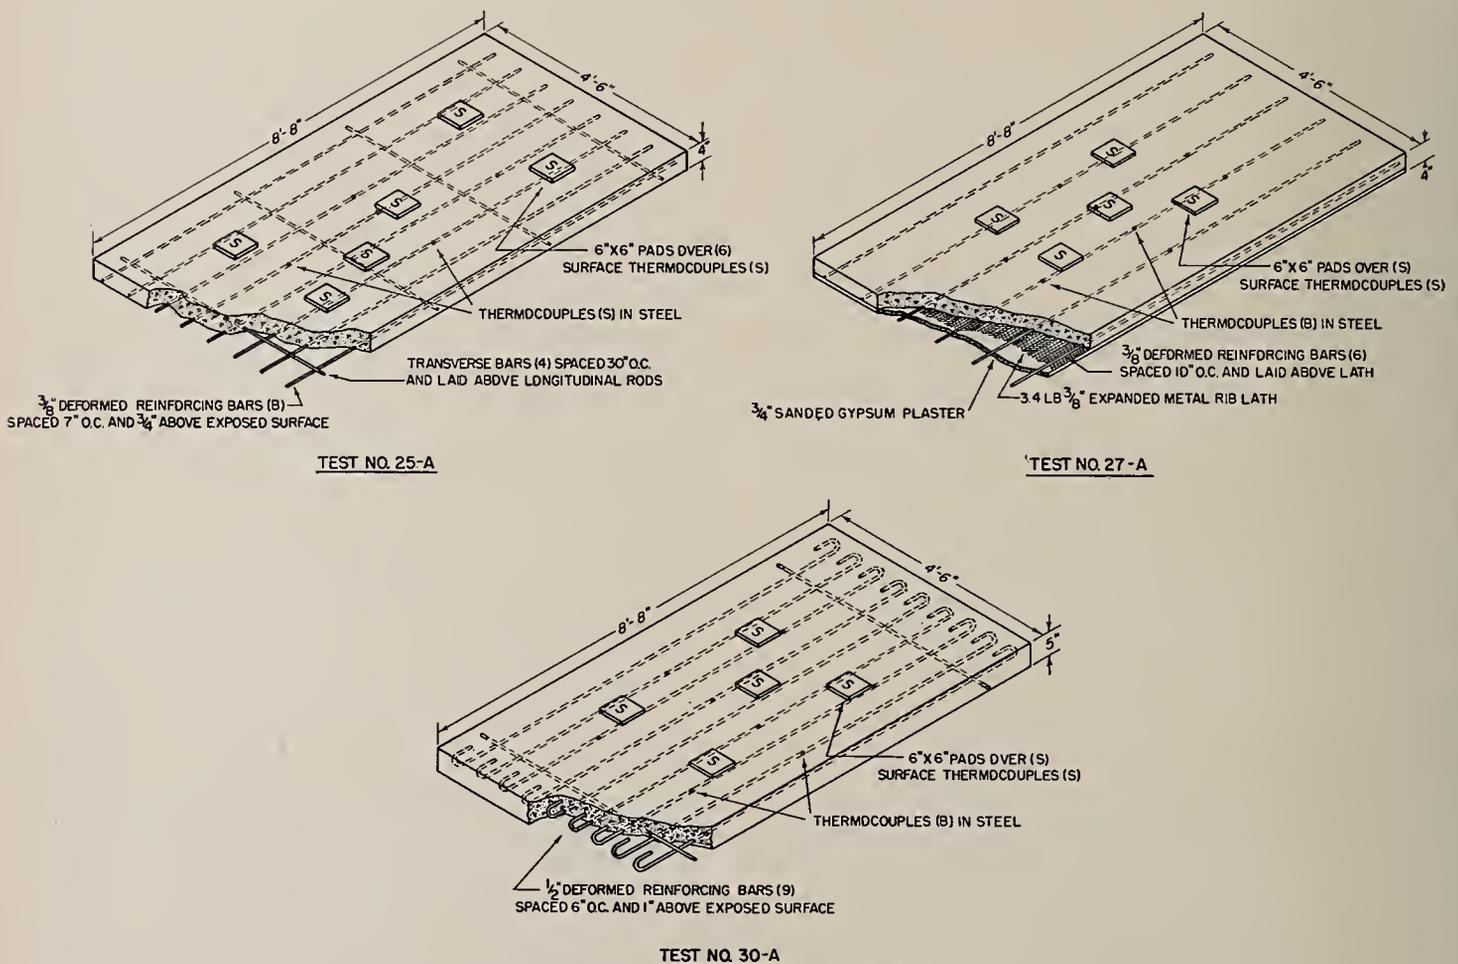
Construction of floors 25A, 27A, and 30A.
